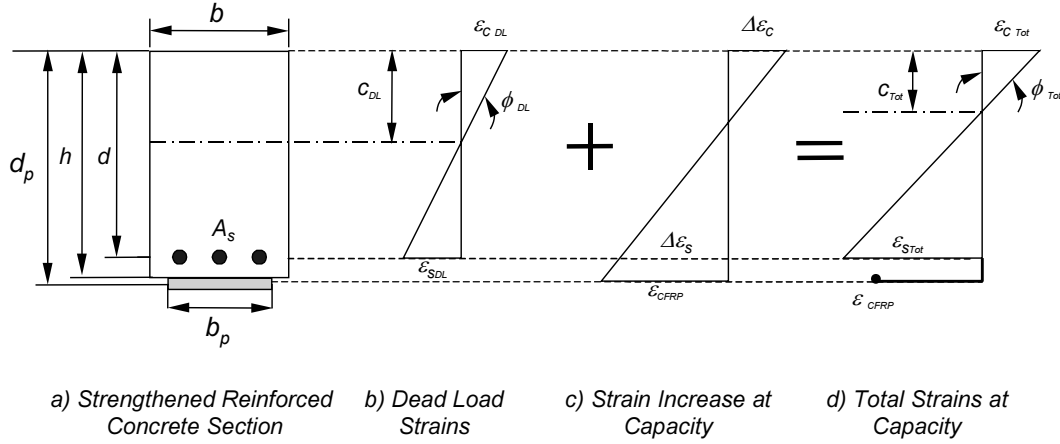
Increment of Strains on Strengthened Reinforced Concrete Section
